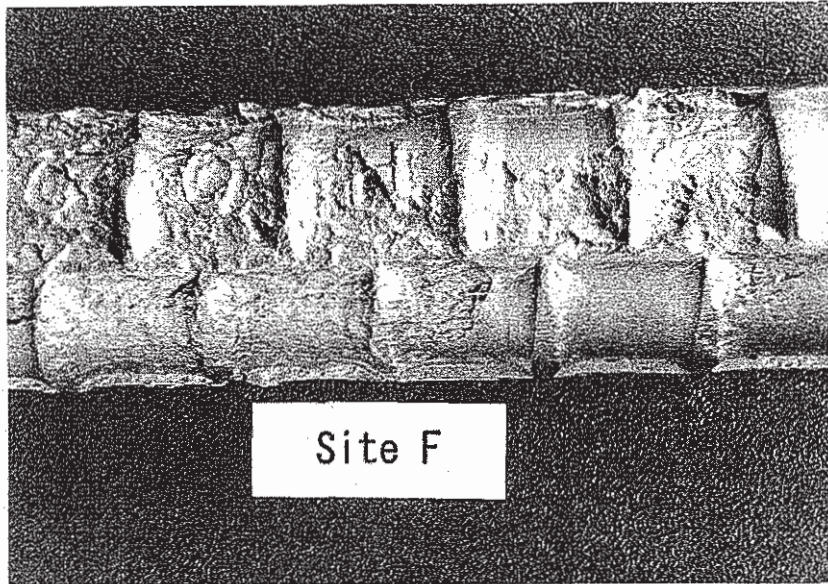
Corrosion of reinforcing bar (Site F).
